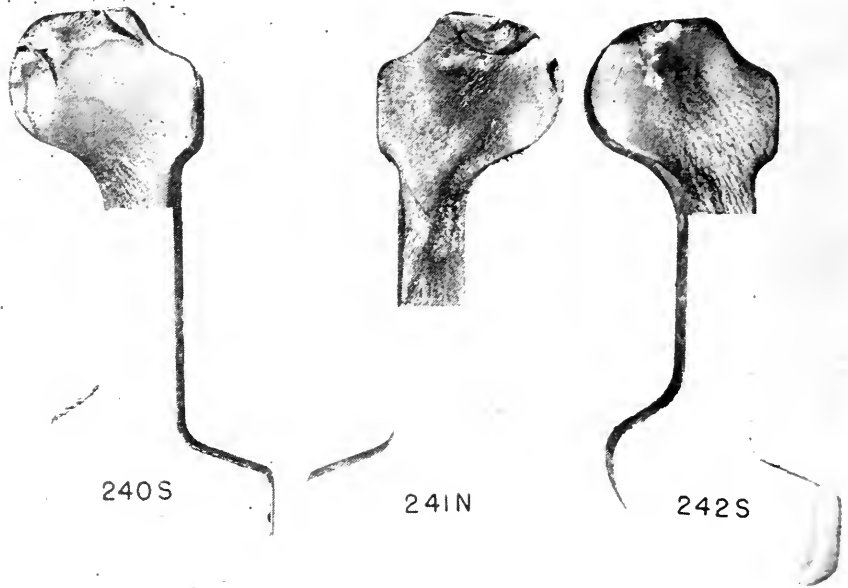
Fatigue failures of 132 RE HF bars.
